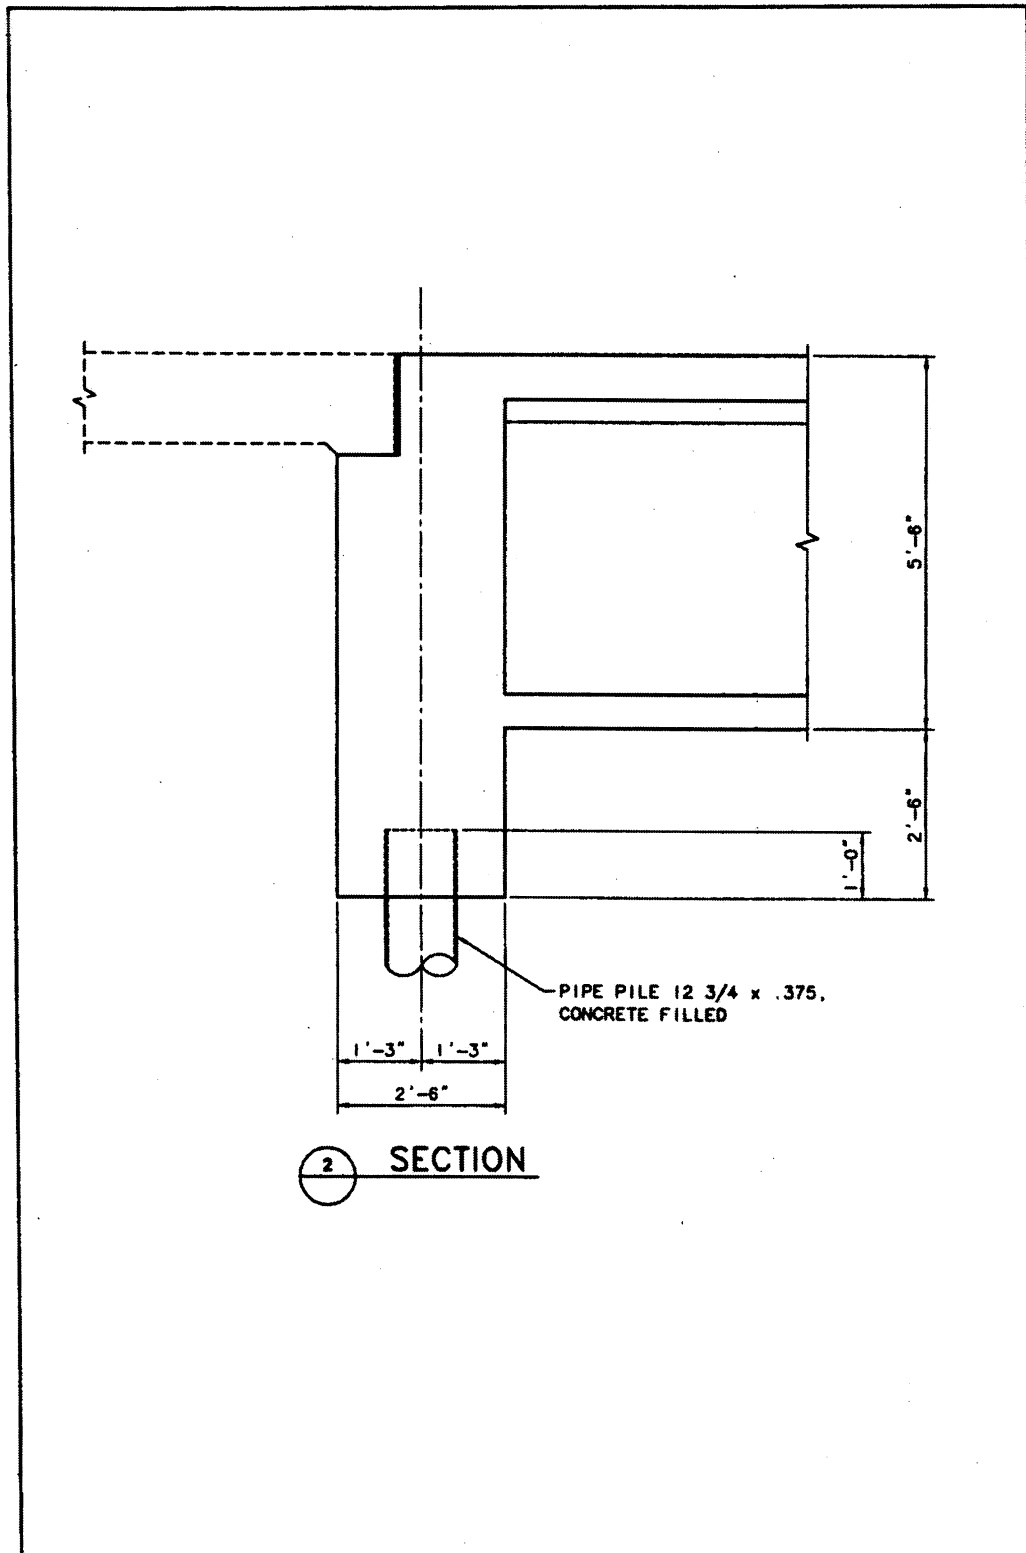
Bridge No. 6 – Section at Abutment
